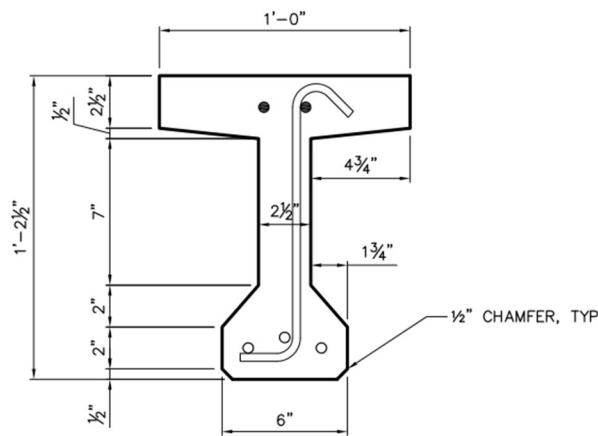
TYPICAL BEAM CROSS-SECTION
